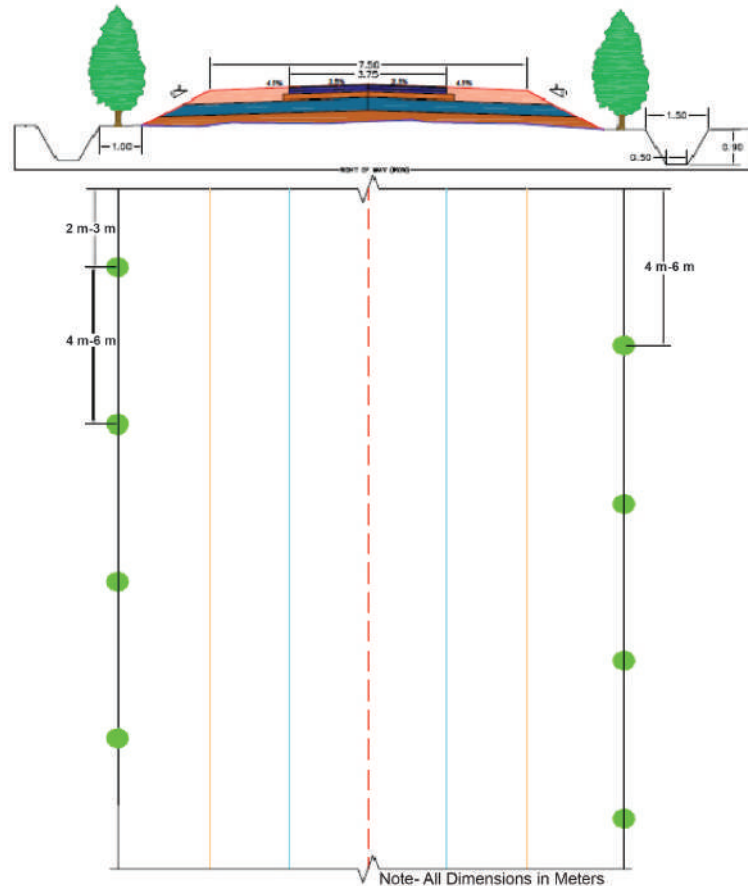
Typical Cross-Section and Plan for Single Lane (3.75 m Carriageway) and 7.5 m Formation Width in Rural Area
